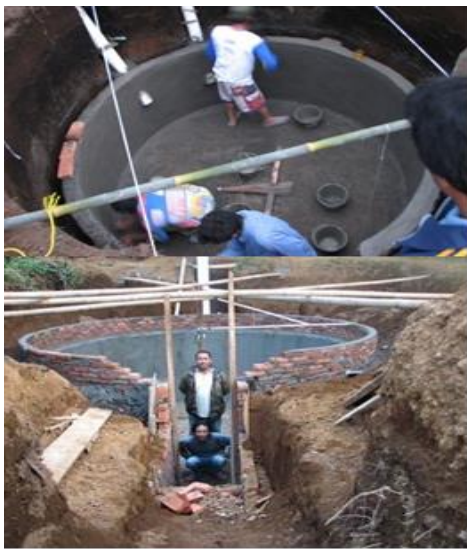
Development of reactor construction Casting of reactor foundations and walls.
